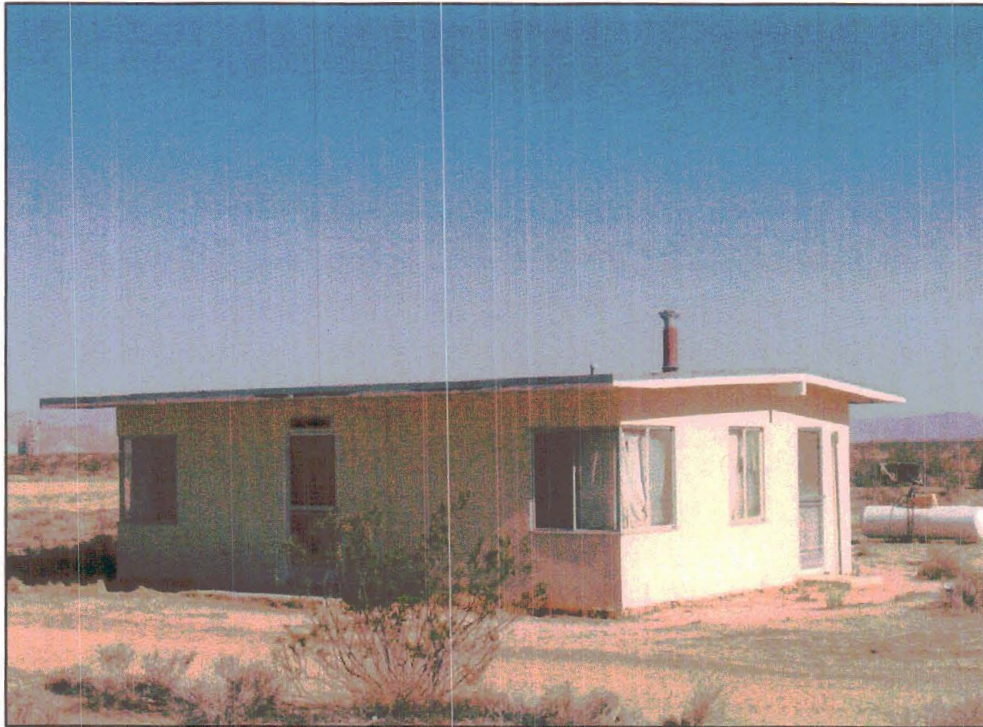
Dwelling on Parcel No. 0460-242-20; view looking east.
